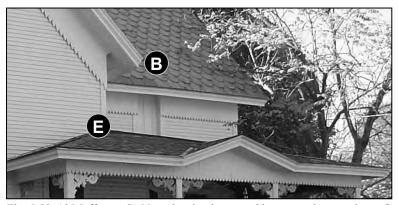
125 Jefferson St. New slate has been used here to replace portions of the roof that have been damaged.
